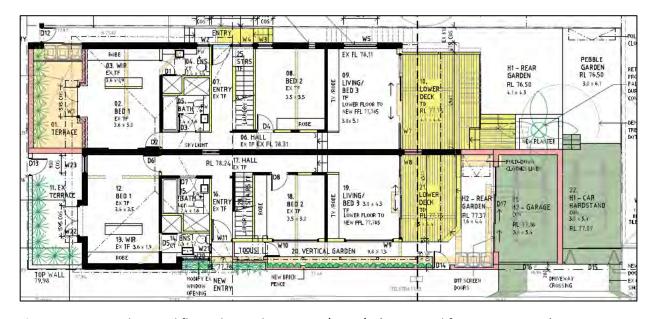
Proposed ground floor plan under DA-114/2021/1 (Source: Edifice Design, 2021)
